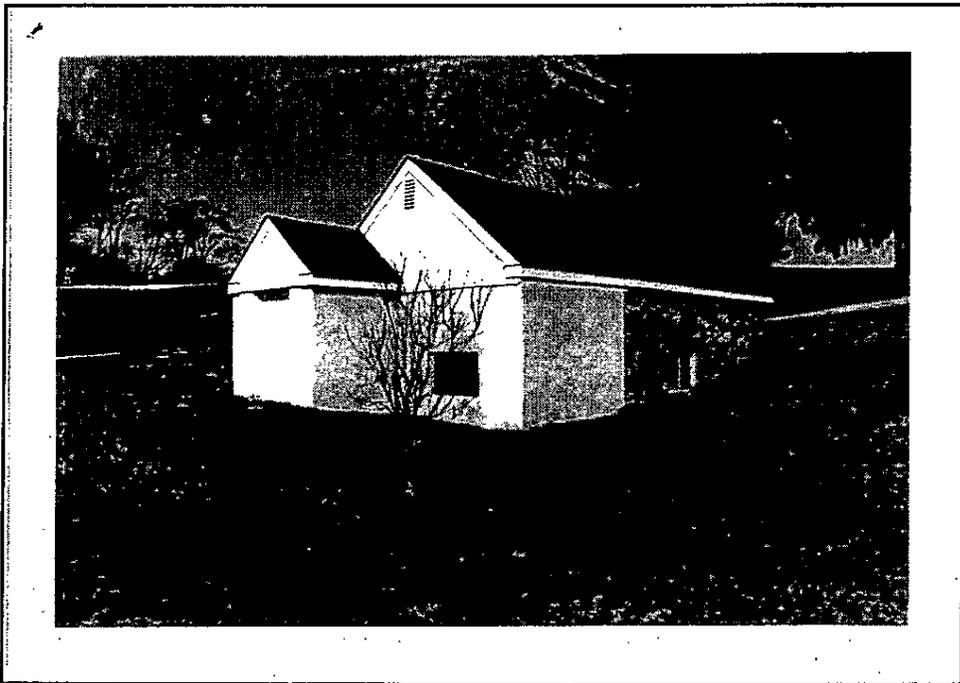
Springhouse, Barley Mill Stables (N-4066), Southwest and Southeast Elevations, Looking North
